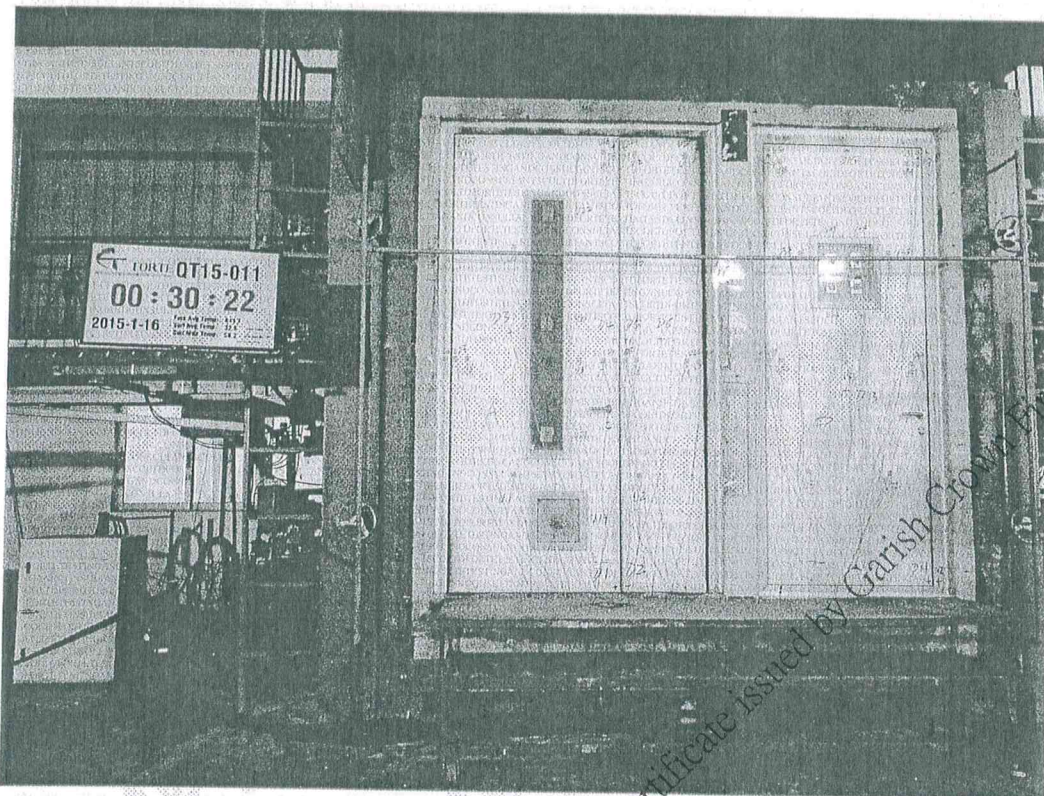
Unexposed surface of the specimen at 30 minute of test.
